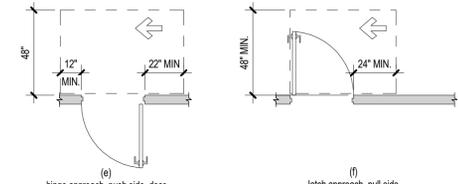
(e) hinge approach, push side, door provided with both closer and latch
